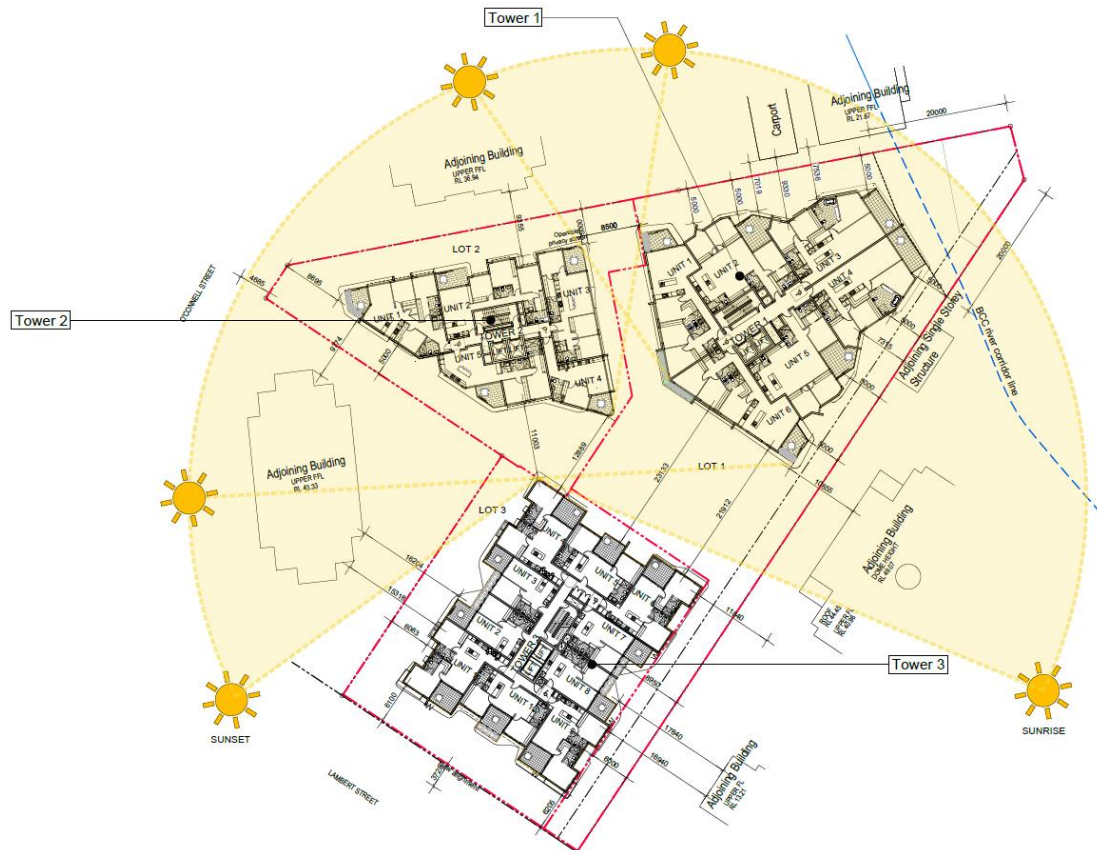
Extract from DA15.0245 – Floor plan and access to sunlight
